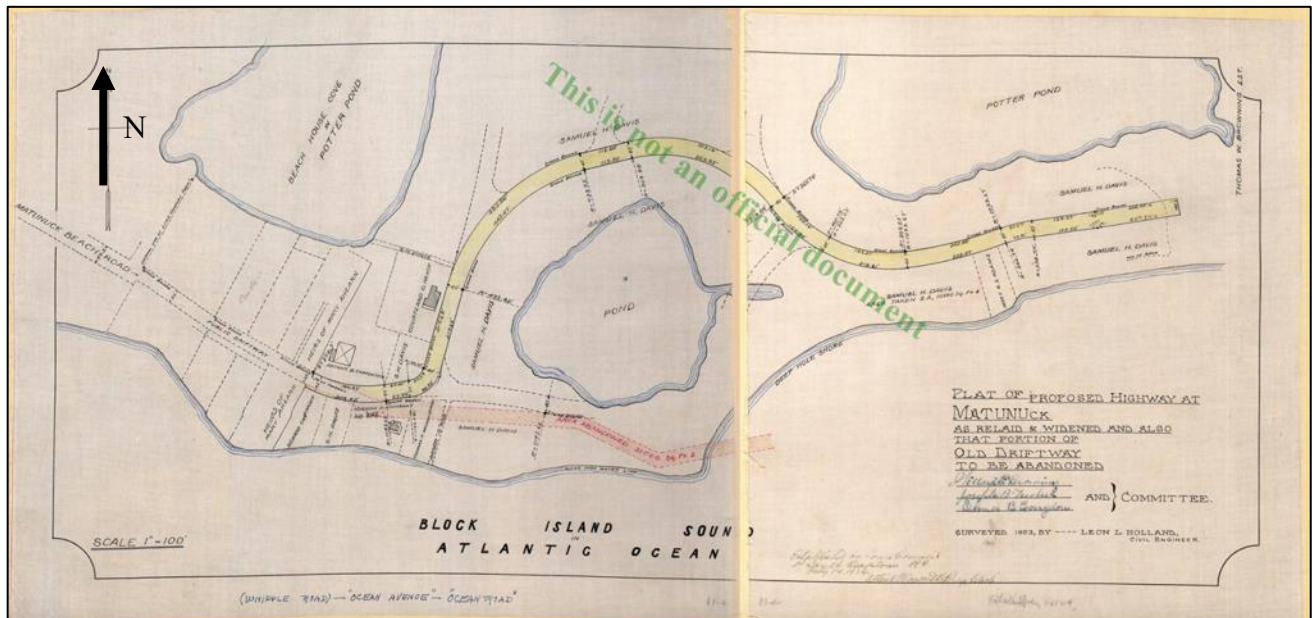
Leon L. Holland, Civil Engineer, “Plat of Proposed Highway at Matunuck as Relaid and Widened and Also That Portion of Old Driftway to Be Abandoned,” 1923, South Kingstown Land Evidence Records, Plat Book 6, Page 456.<sup>35</sup>
